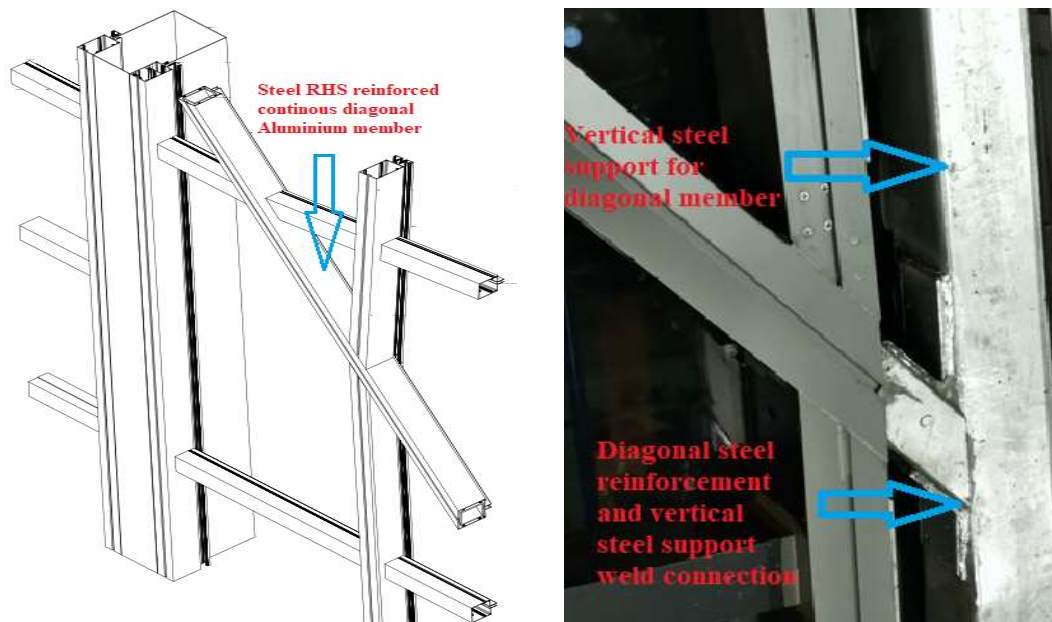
Steel reinforced diagonal aluminum member unitized curtain wall design approach
